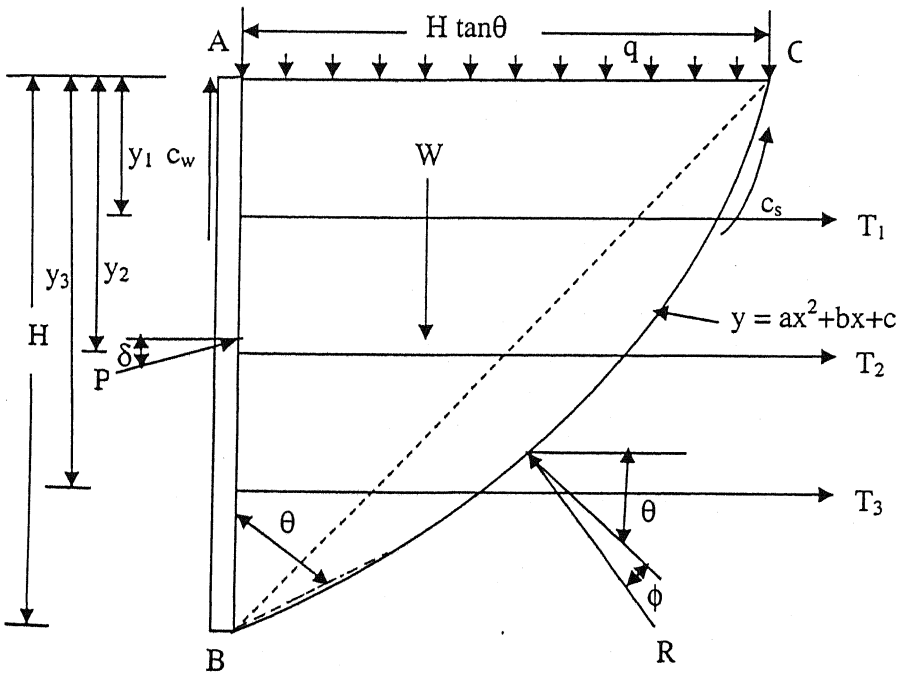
Forces acting on cantilever retaining wall (uniform surcharge, reinforced backfill)
